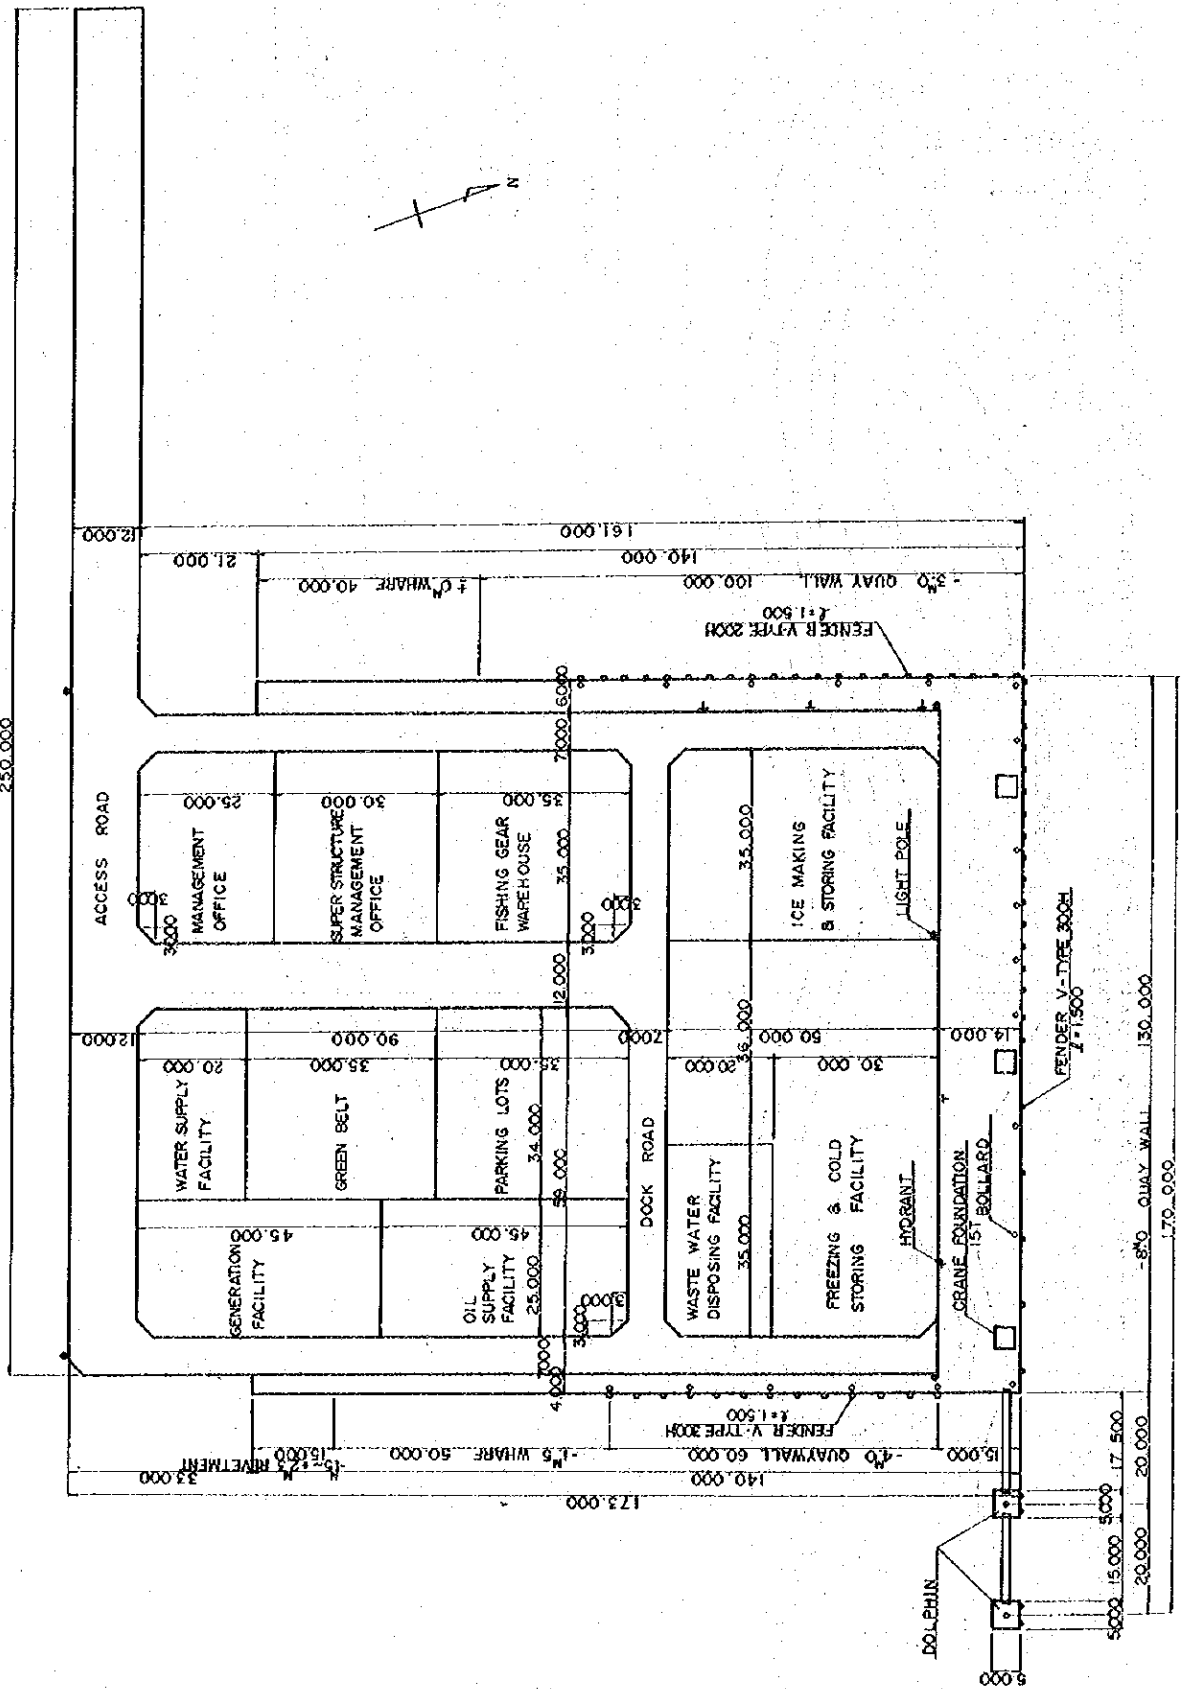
(2) RABAU FISHING BASE PLAN (NO.2) S = 1/600
